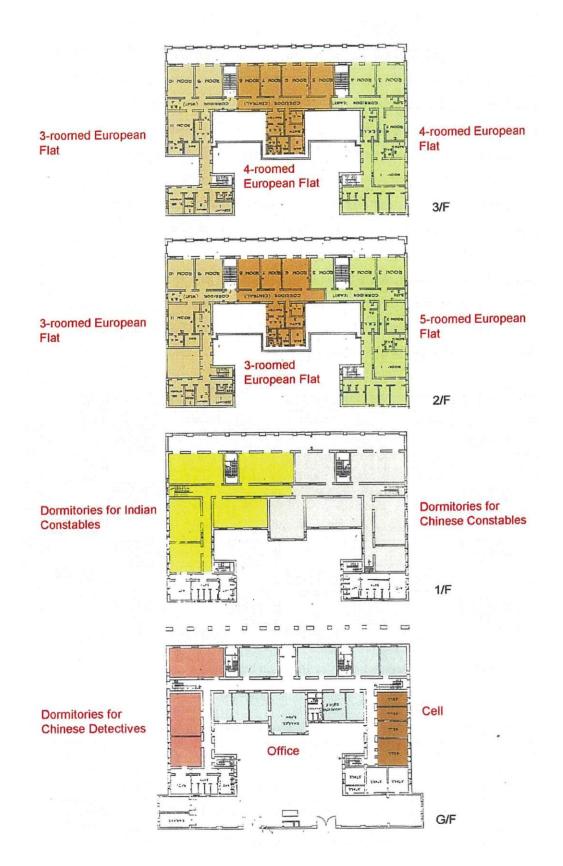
Floor plans before 1949 showing original zoning of the building [Cody, Jeffery William and Tsui, Chung Man, *Architectural Appraisal of the Wan Chai Police Station*]
